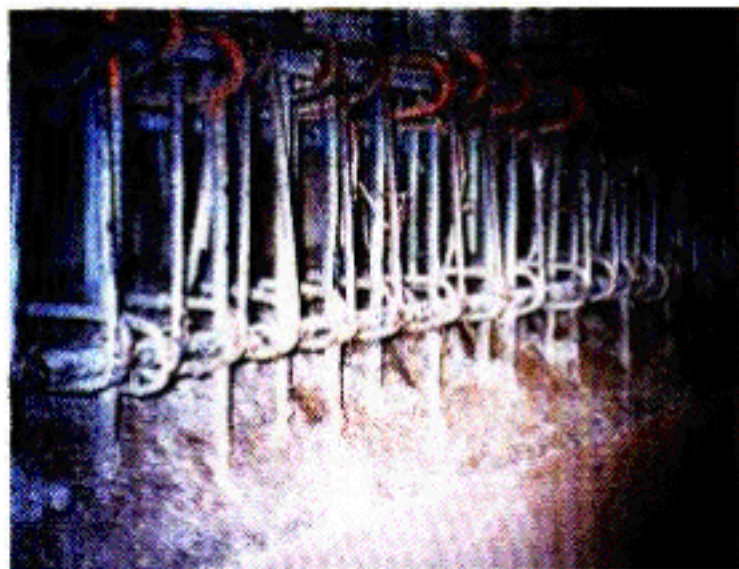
Construction joints should be located between horizontal rebar and sloped toward the face, to enable easy escape of rebound in succeeding work.
